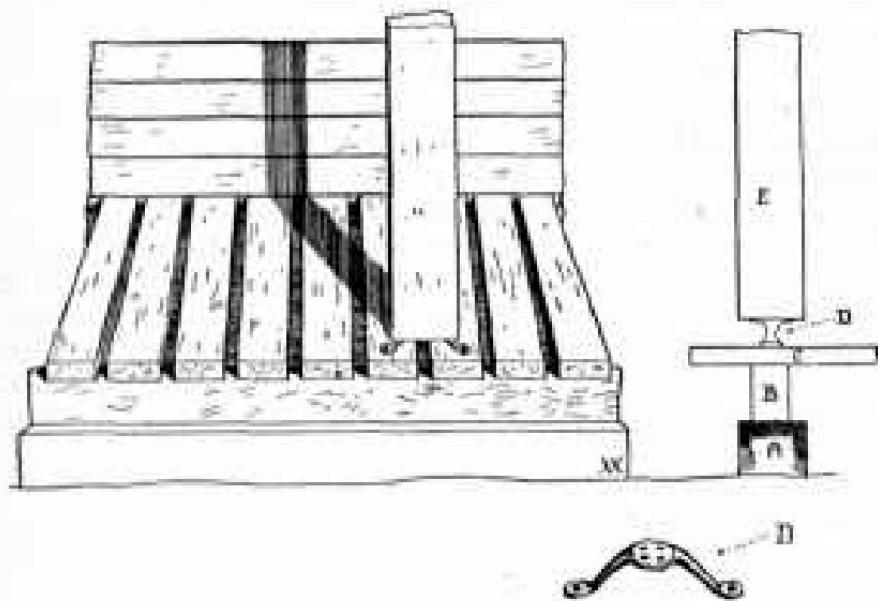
Properly laid platform planking and foundations for pillars, Falls Church, Va.: A, concrete base; B, stringer; C, planking; D, iron rest; E, pillar. (Original.)
